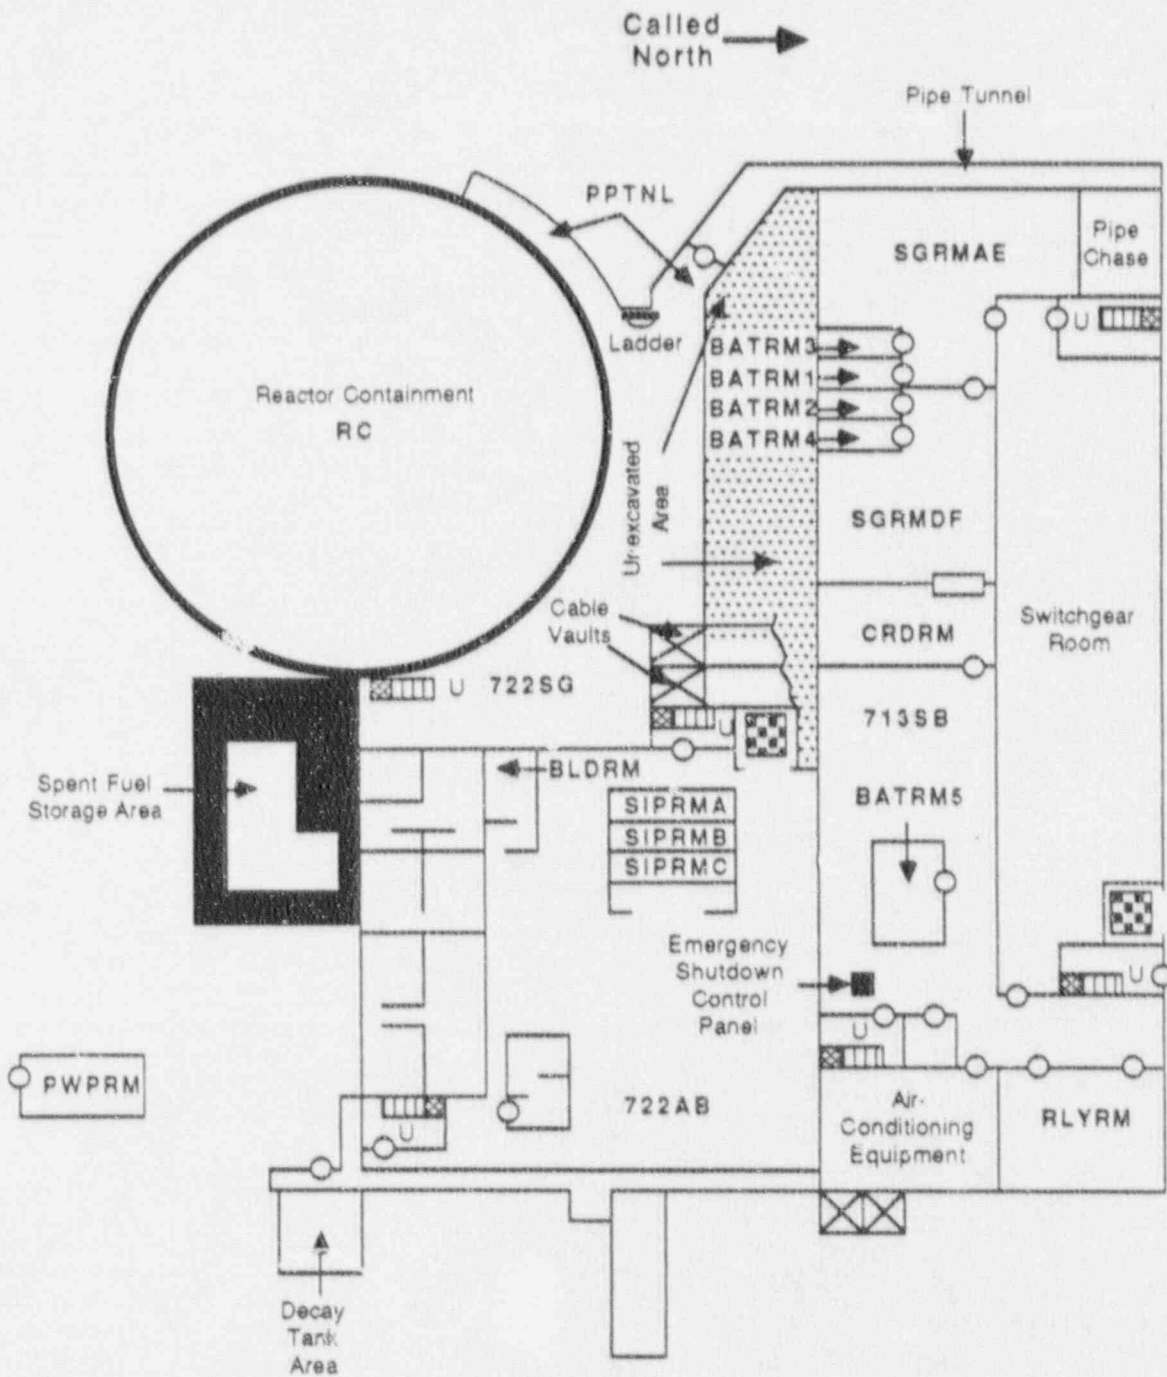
Beaver Valley Unit 1 Station Arrangement, Elevation 713'-6"
